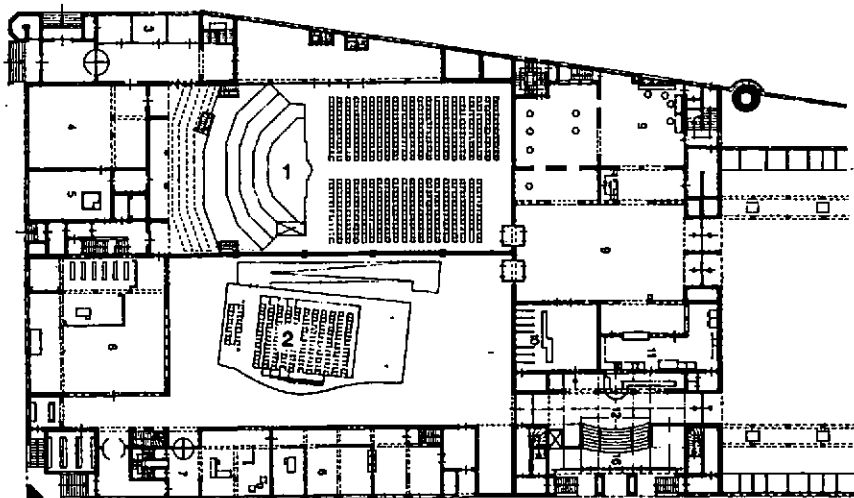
Plan View 1. Wang Hall 2. AGA Hall
